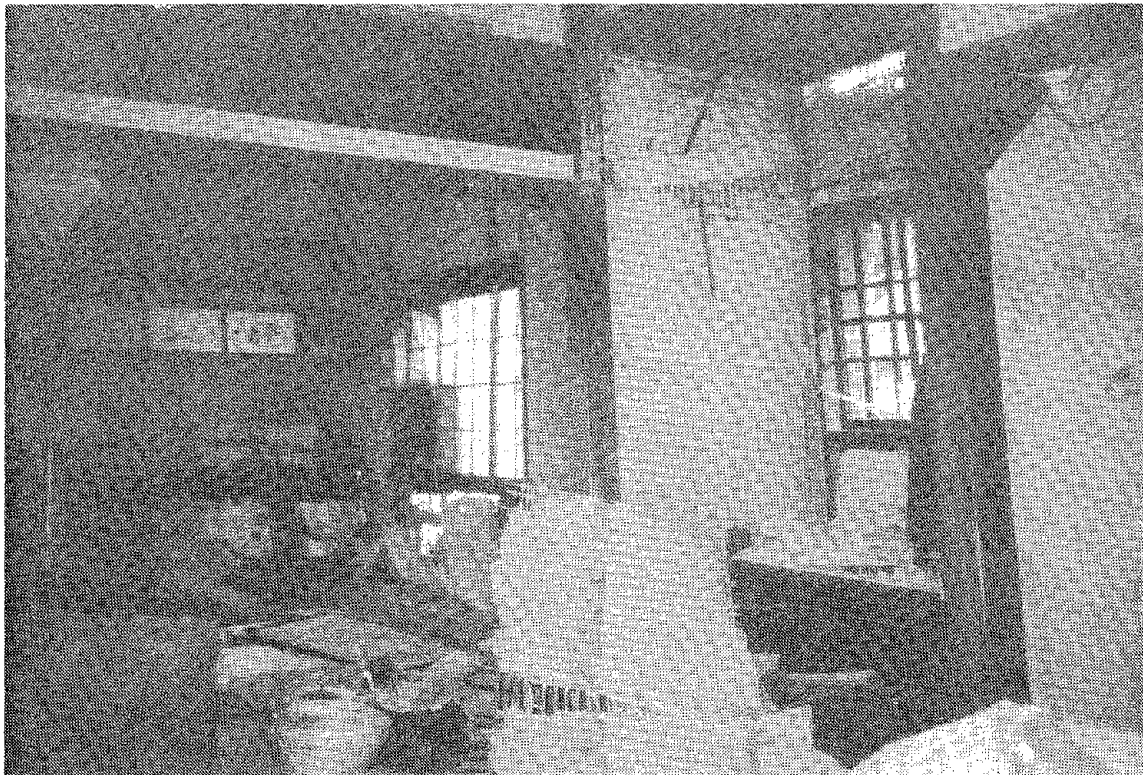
and 5.18 Takahashi/Kawai house. View of second floor.
